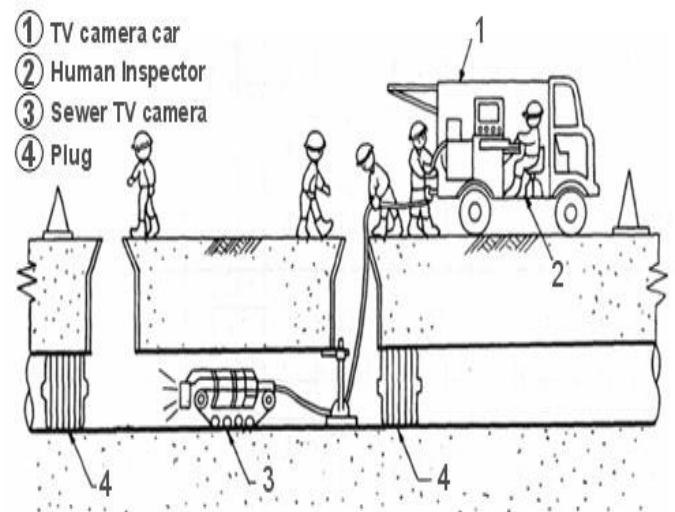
the inspection of sewer pipes is undertaken using a cable-tethered robot with an on-board video camera system. An operator remotely controls the movement of the robot including a video system
